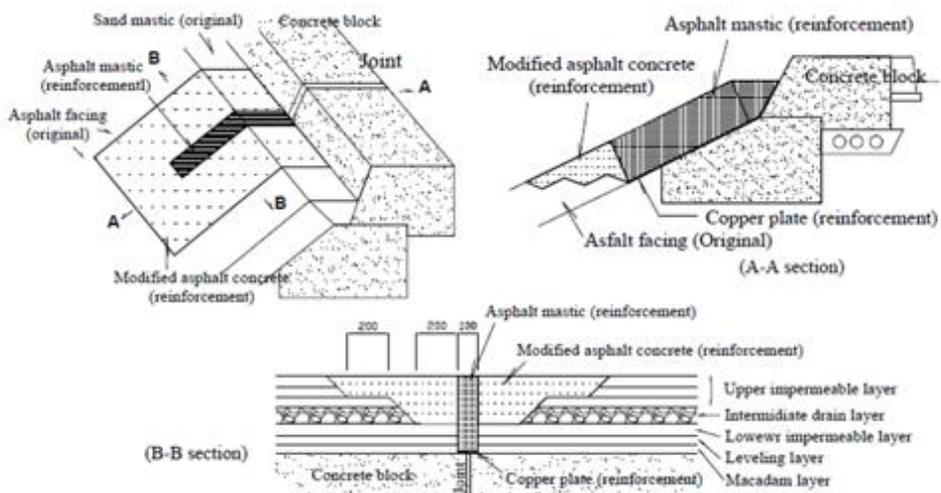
Reinforcement at the dam crest area of Yashio Dam
